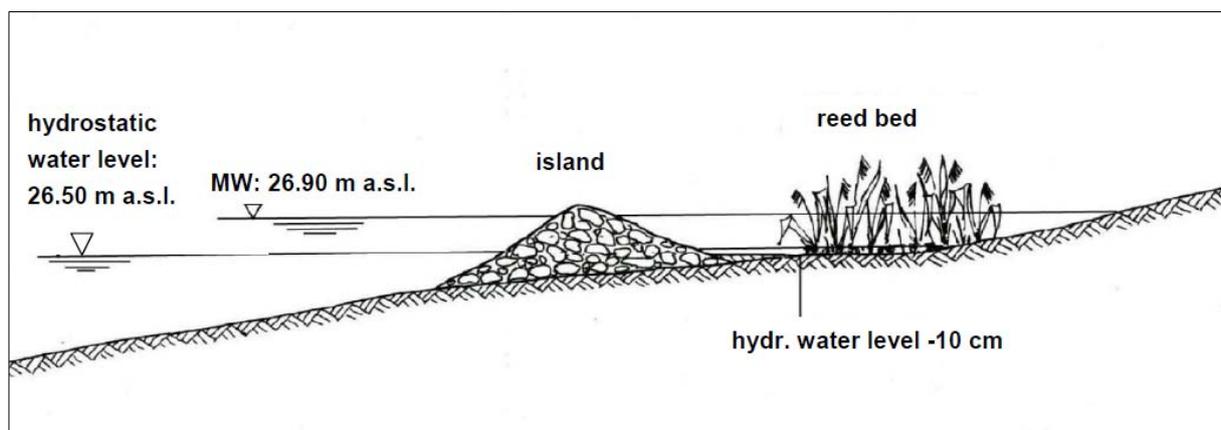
Reconstruction of the bank by installation of an island-like stone mound: profile of Section 5 (from original plans)
